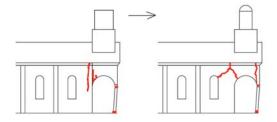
Typical crack damage at the corner of the side elevations and front facade or portico from rocking of the bell tower and portico during an earthquake.
